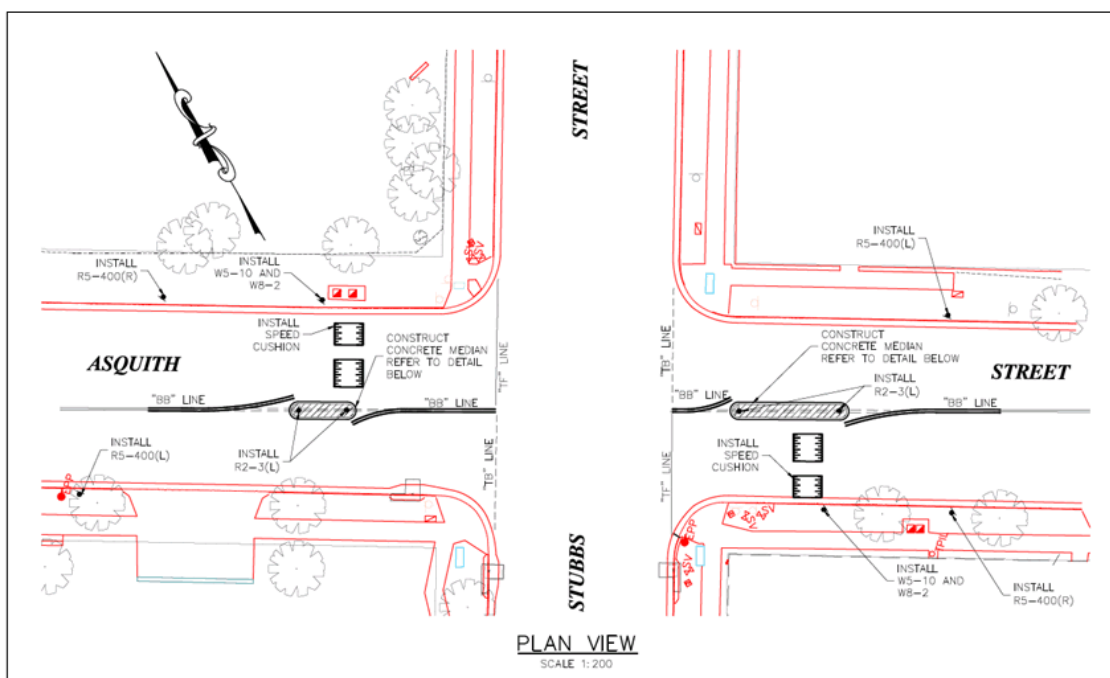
Design plan for the intersection of Asquith Street and Stubbs Street, Silverwater
